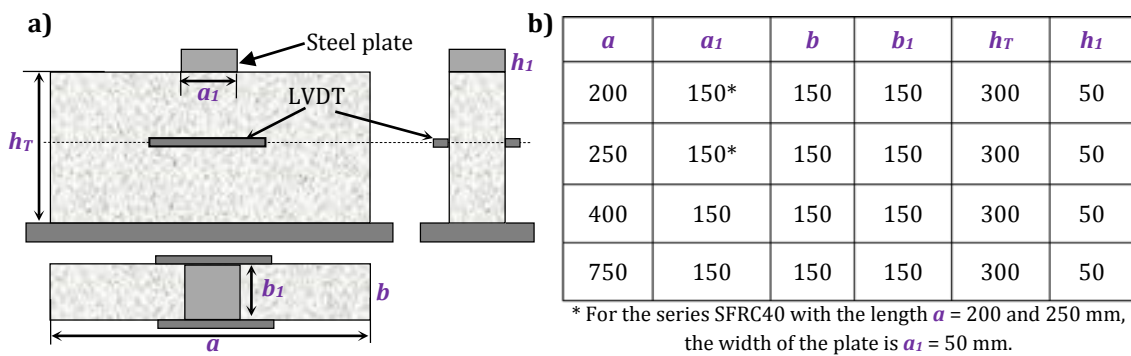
Three-view plan schematic of the instrument set-up, and b) dimensions of the blocks and support plates
